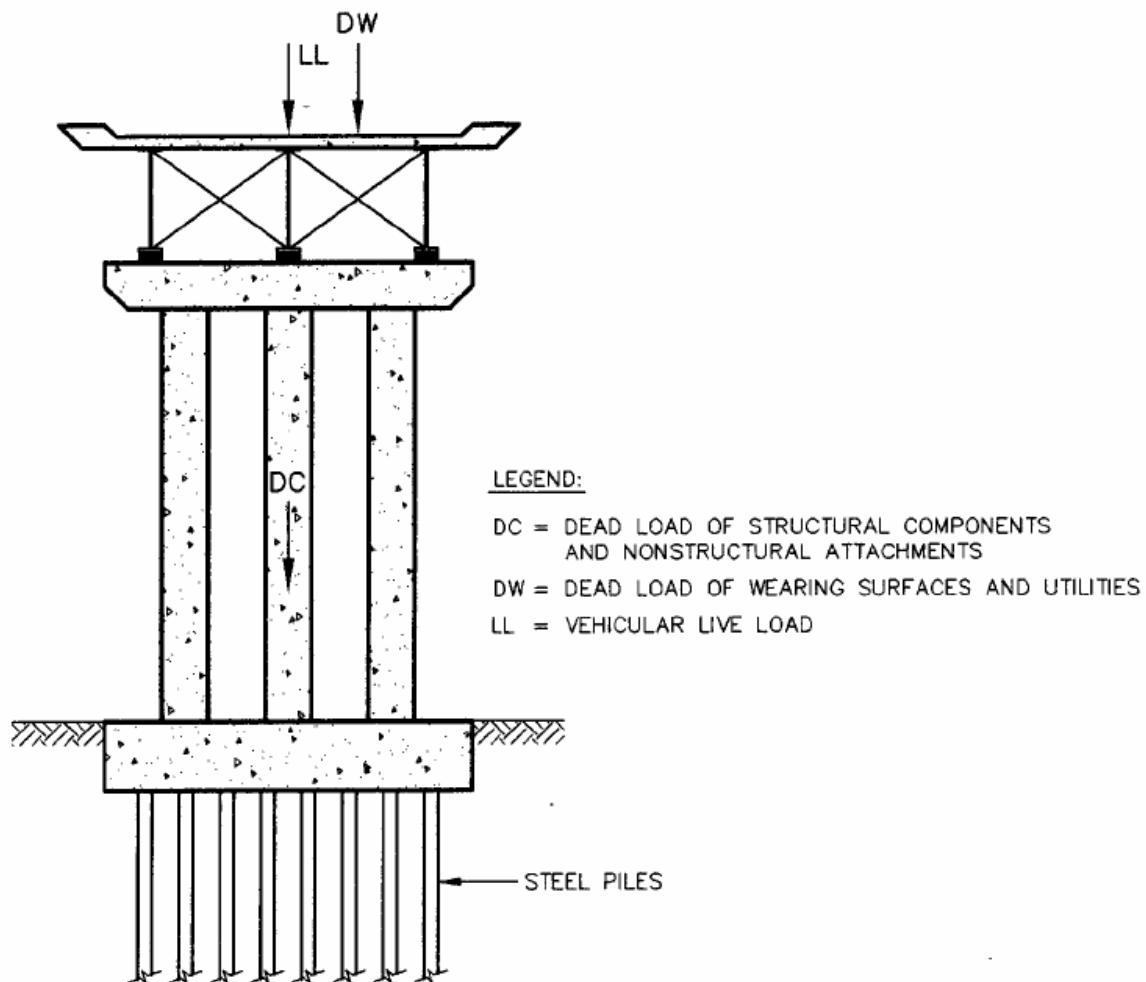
Bridge substructures configuration and loading for Example Problem 9.
